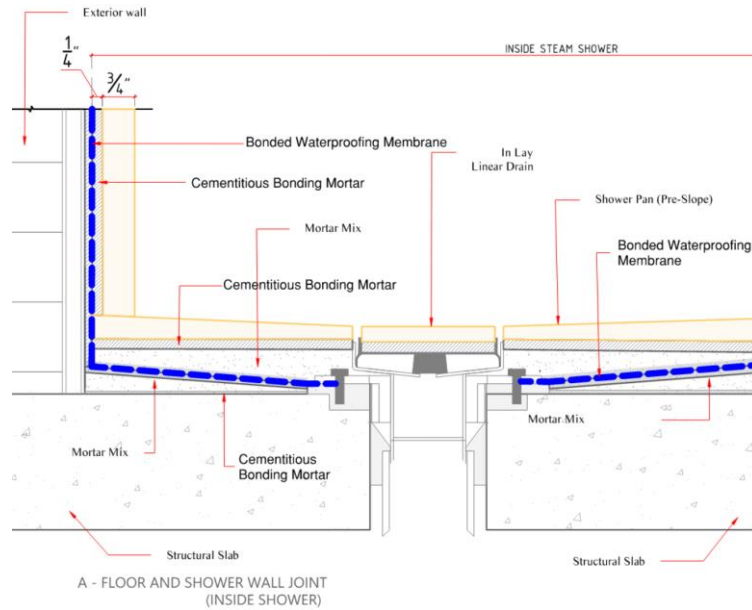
Zoomed Steam-Shower Wet-Core Section Showing Sloped Mortar Build-Up to A Linear Drain and Continuous Bonded Waterproofing at the Wall-To-Floor Interface
